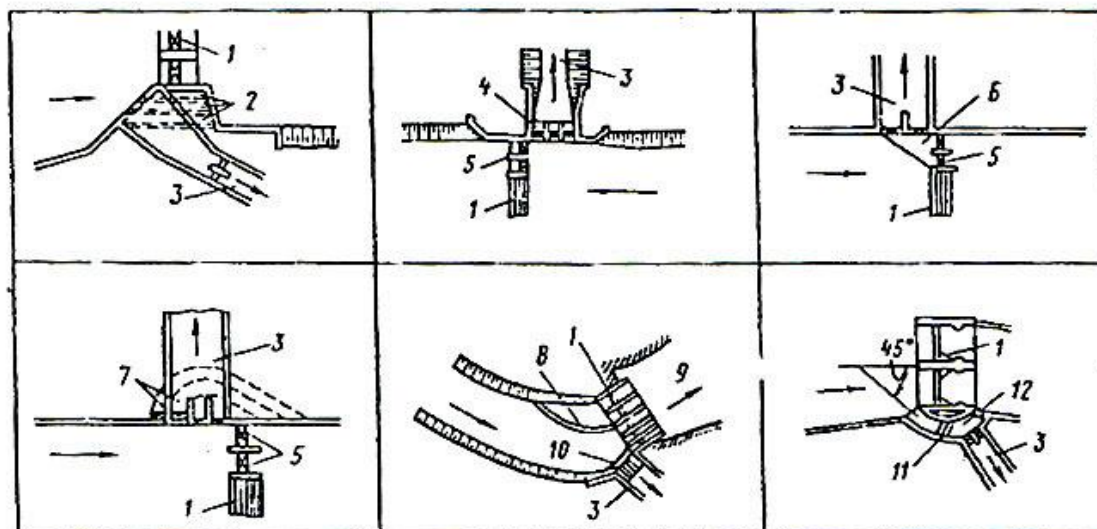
/24. Correct hydraulic design for skimmer wall. (After K. T. Strauch)
